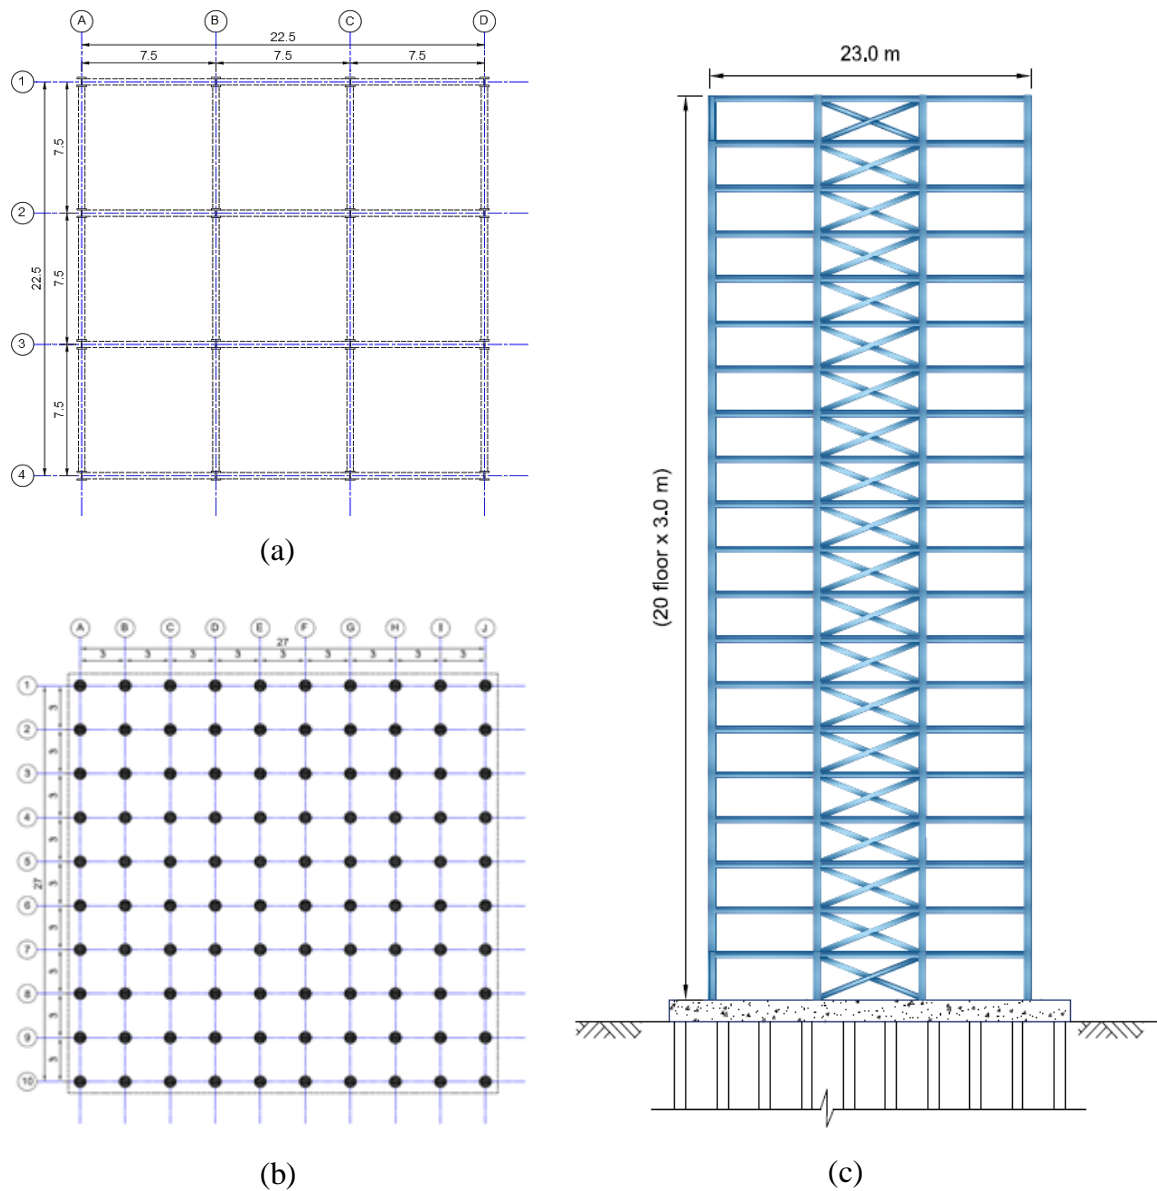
Layout of Case Study: (a) Layout of Beams and Columns, (b) Layout of Piles, (c) Main Frame of the Case Study
